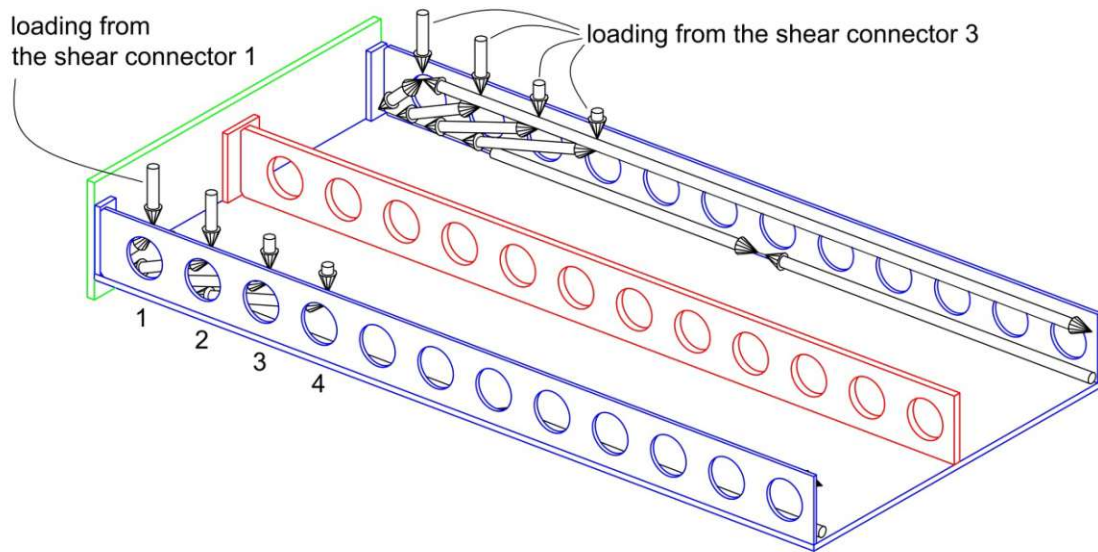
Truss frame model to symbolise the load transfer to the support from the outside shear connectors
